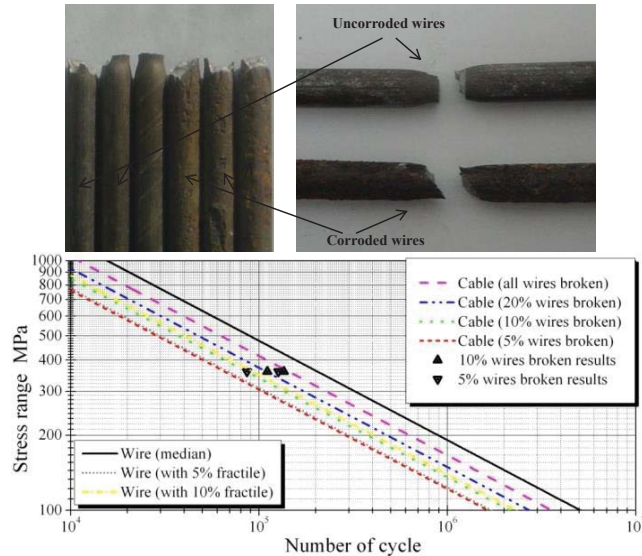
Fatigue failure of individual steel wires and fatigue life of cables with corrosion
